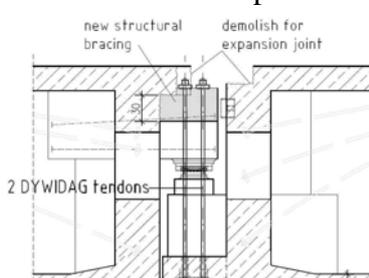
Hinge in the crown with prestressing anchor and spherical bearing
